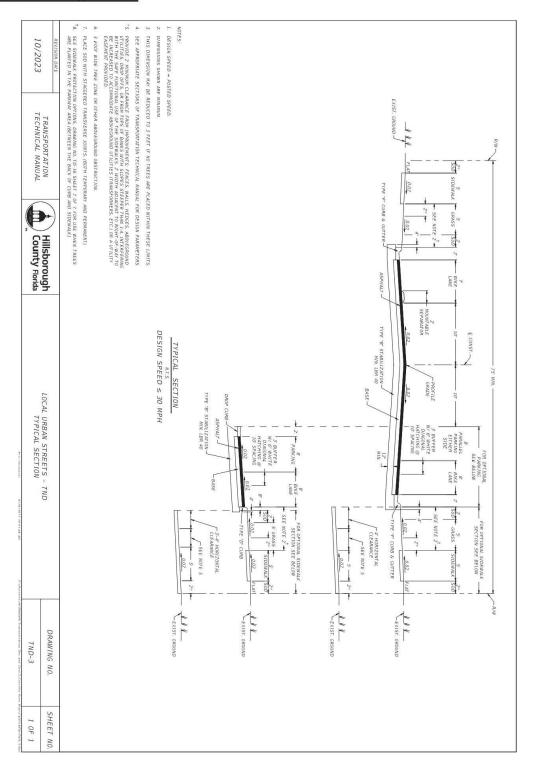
Exhibit B: Proposed 56' Private R-O-W Section with On-Street Parking
